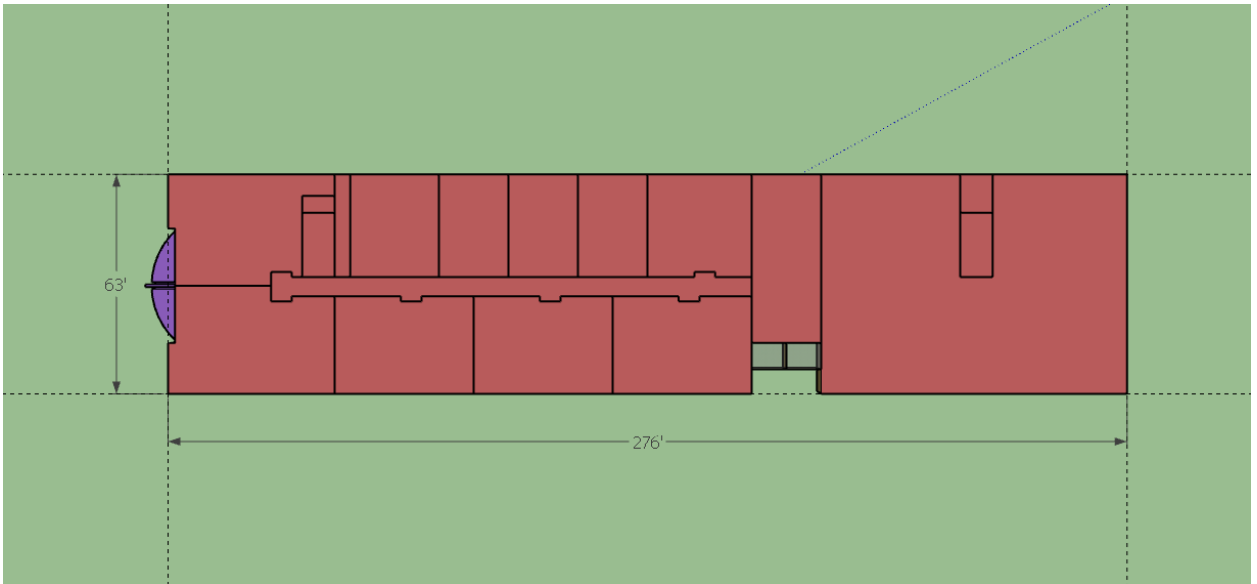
A two-dimensional rendering of the floor plan for the building's ground floor, using SketchUp Pro 2019 and OpenStudio
